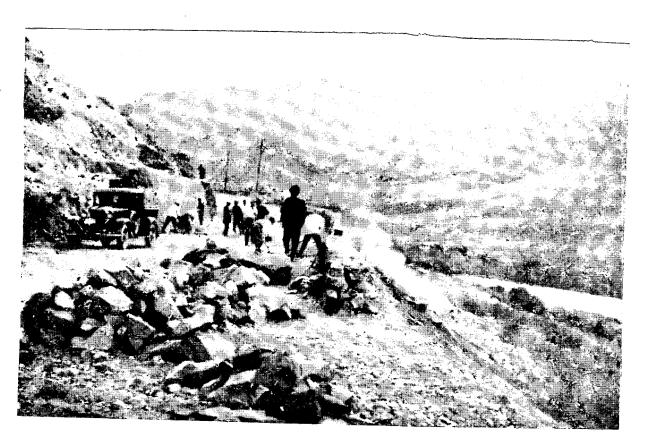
Construction work on the Frunze-Rybach ye Highway.
